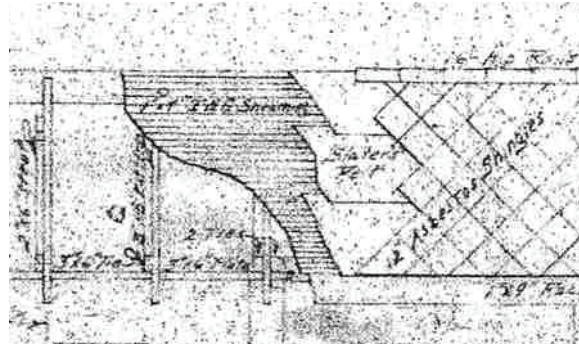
Close-up of roofing details from 1912 elevation of "Boat House & Marine Railway" drawings.
